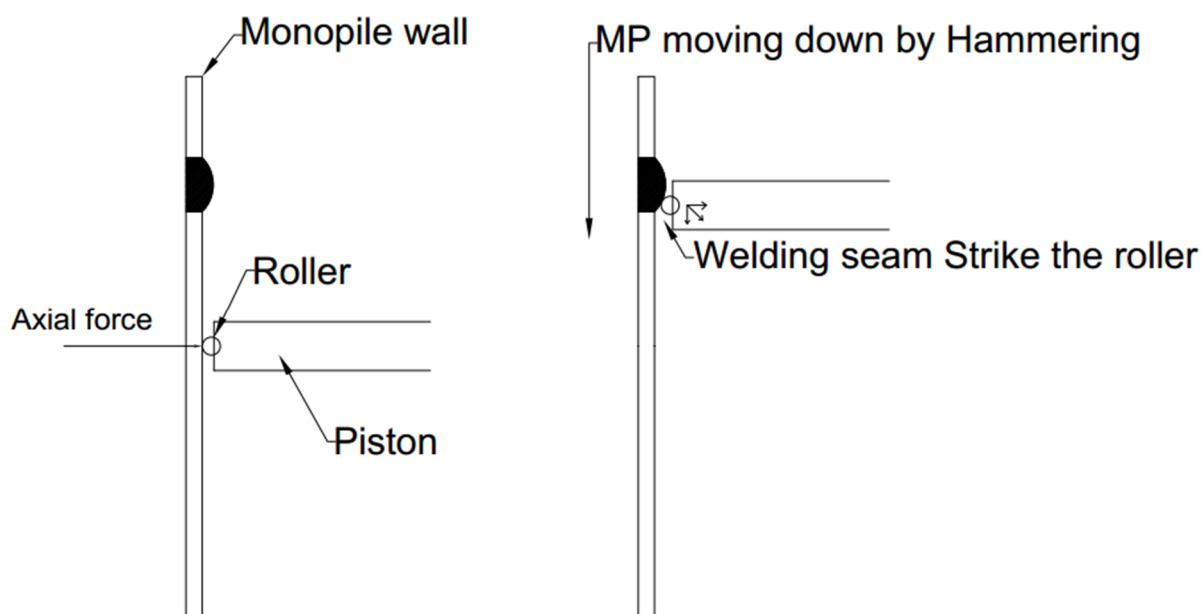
Monopile wall and roller contact and when roller hit the welding seam
